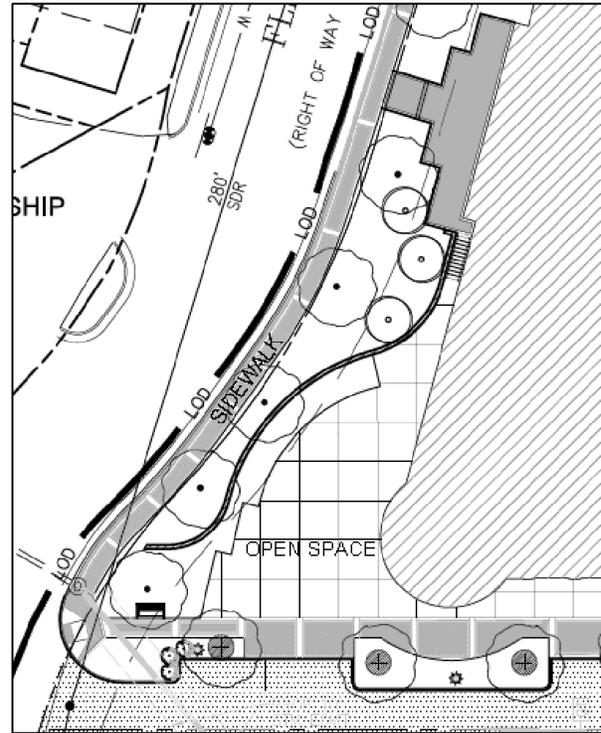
The applicant's design for the plaza serving the residential building's retail space (Source: Bowman Consulting, June 1, 2014)
